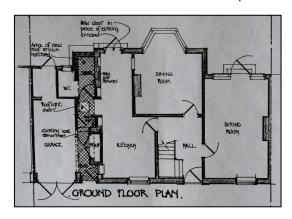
1992 ground floor proposed alterations to 115 Willifield Way (Hampstead Garden Suburb Trust)
